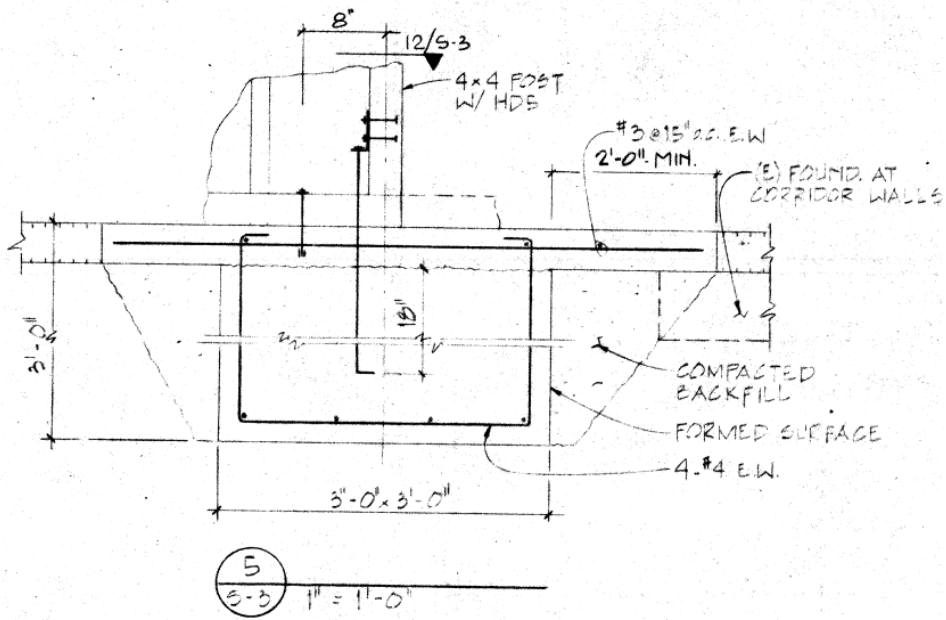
Hold-down Detail at (E) Shear Walls (1993 Renovation)
